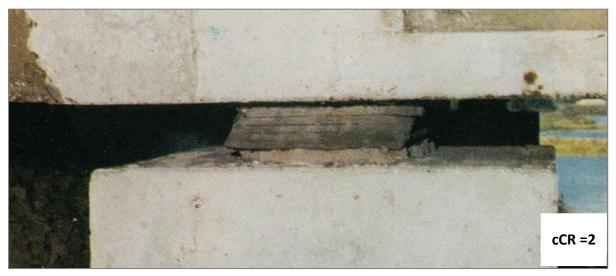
Horizontal Shear Failure of Elastomeric Bearing.
